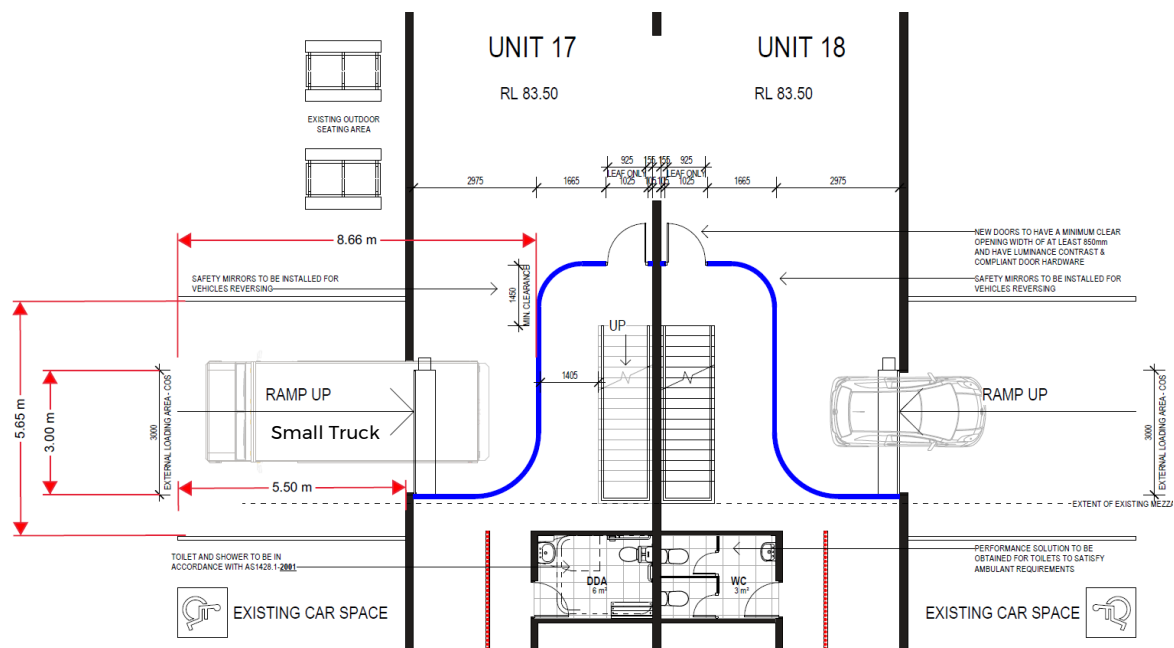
Proposed Ground Floor Plan, Drawing No. A090
